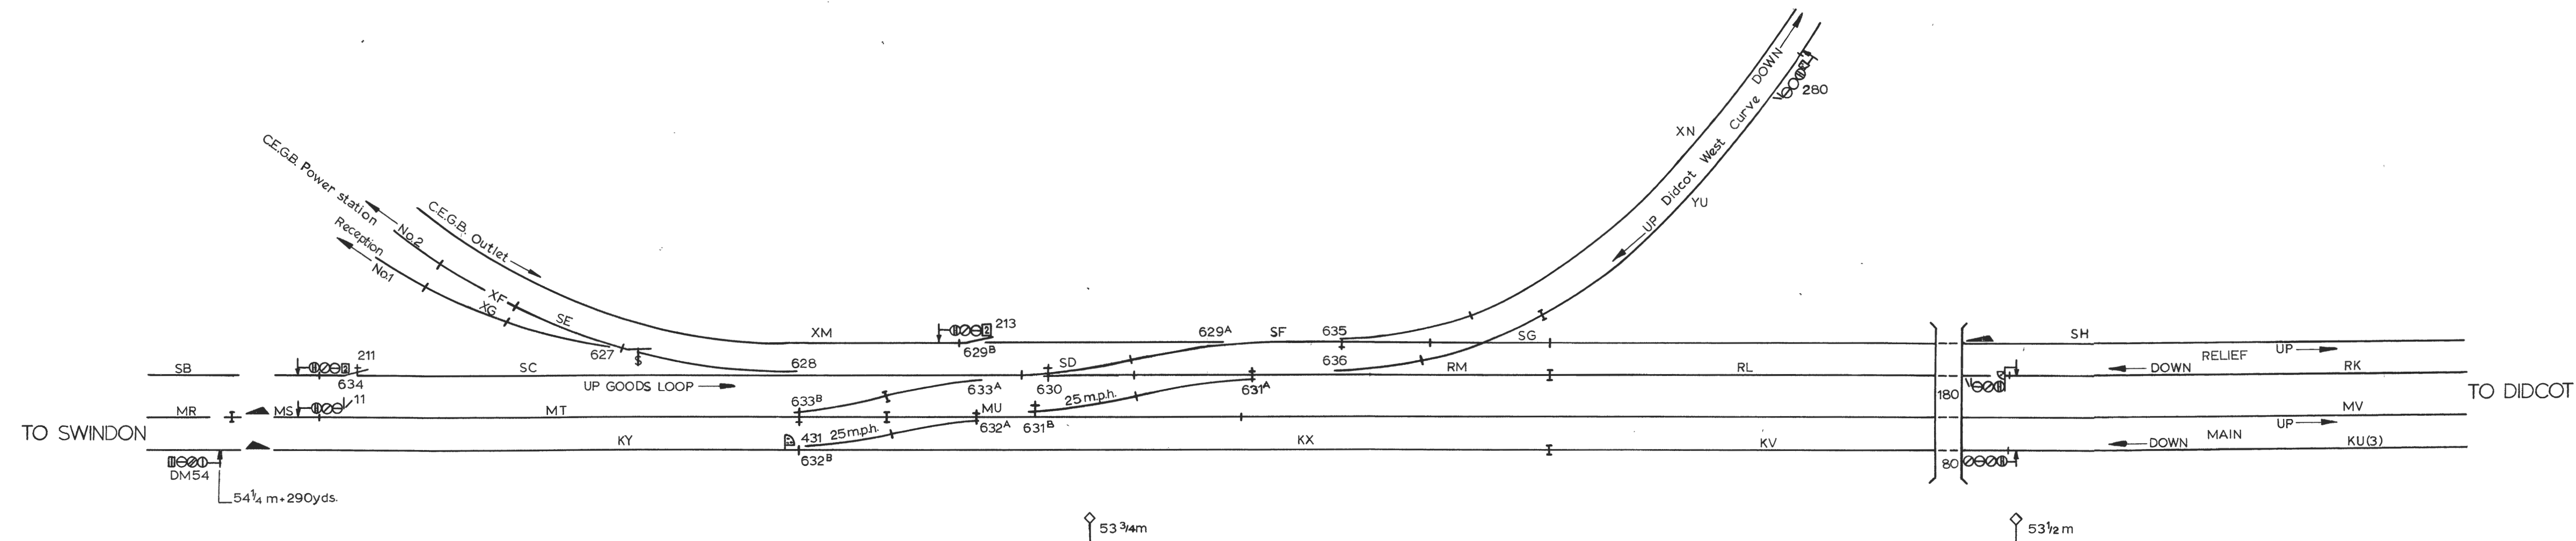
FIG. I. FOXHALL JUNCTION TRACK AND SIGNALLING LAYOUT
